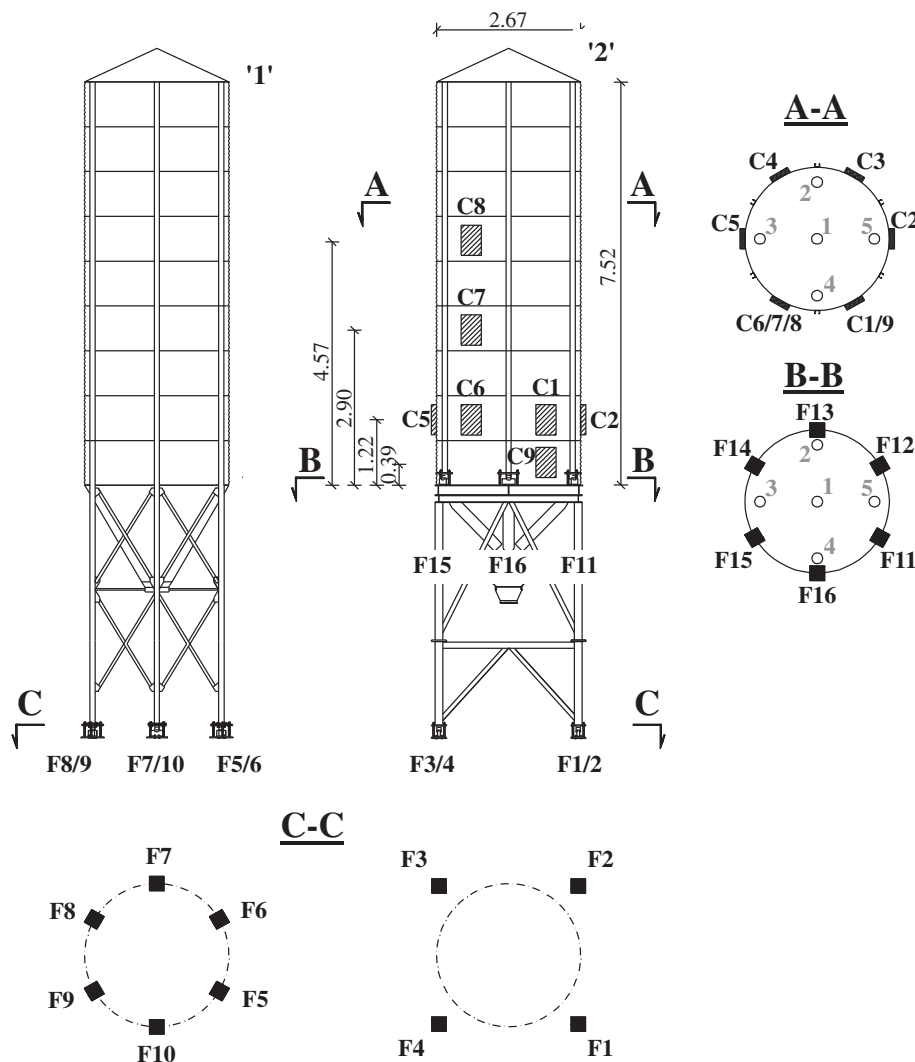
Cylindrical metal silos (storage silo '1' and measuring silo '2') used in experiments (diameter $D = 2.67$ m): location of load cells C1–C9 in corrugated wall and vertical reaction force transducers F1–F16 under silo columns and supporting frame columns
